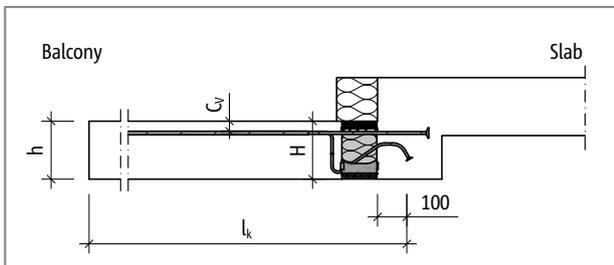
Schöck Isokorb® XT type K-U: Static system
